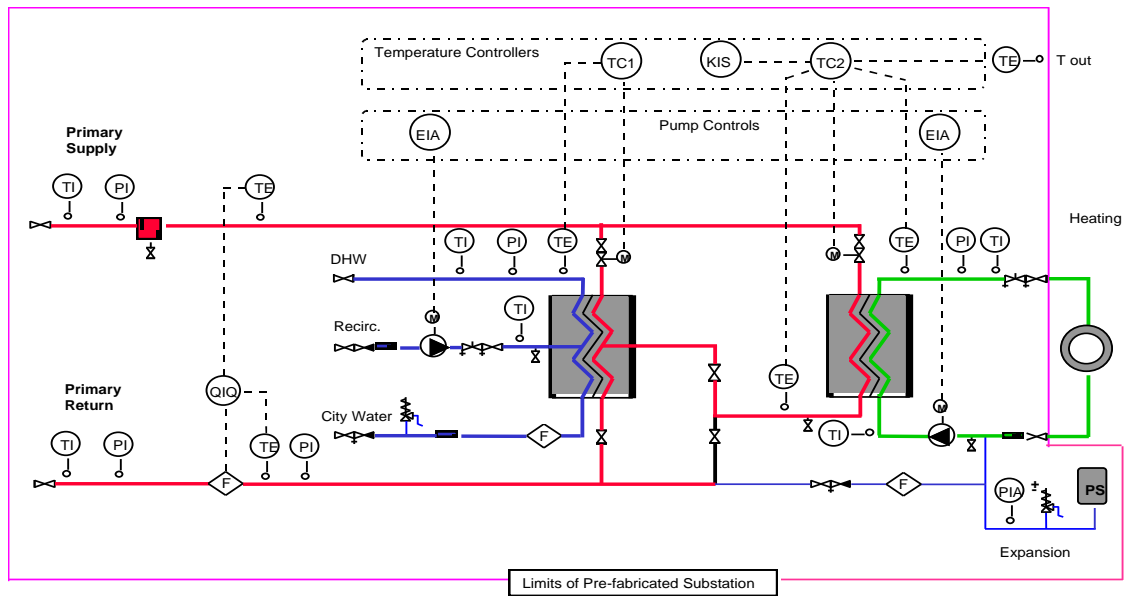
Typical Substation Connection Arrangement (image courtesy of LDA/GLA)
